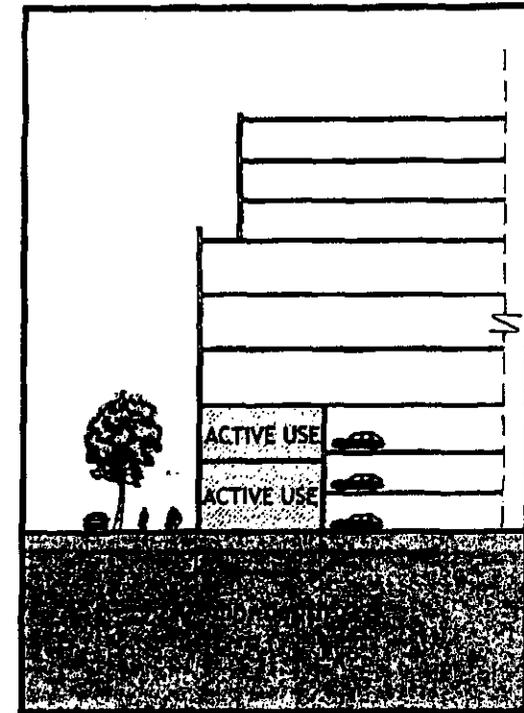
Section showing active use on street frontage; parking garage is not visible from the street
